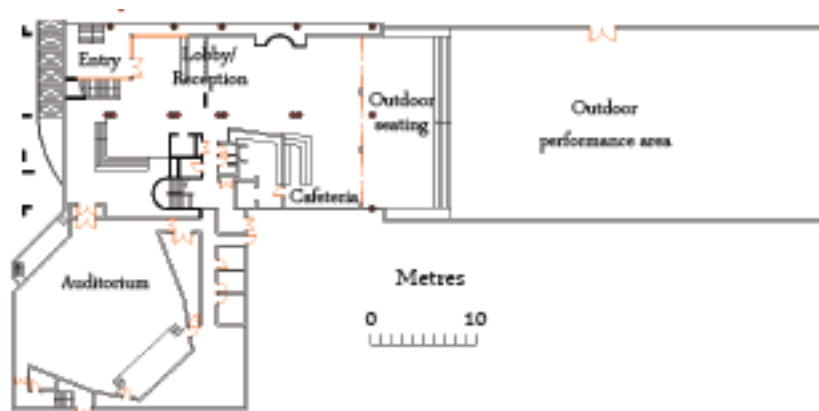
Floor plan of French cultural centre: Source: Loki and Author
